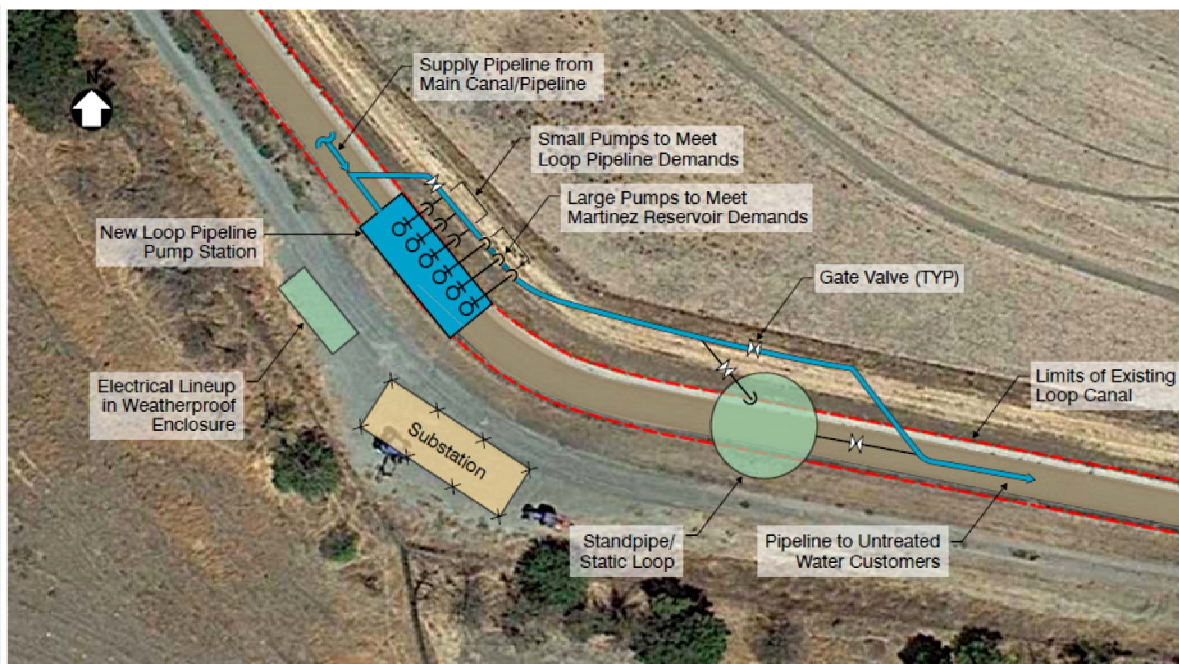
Loop Canal Redundancy Alternative B – Cross Section of New Pump Station
